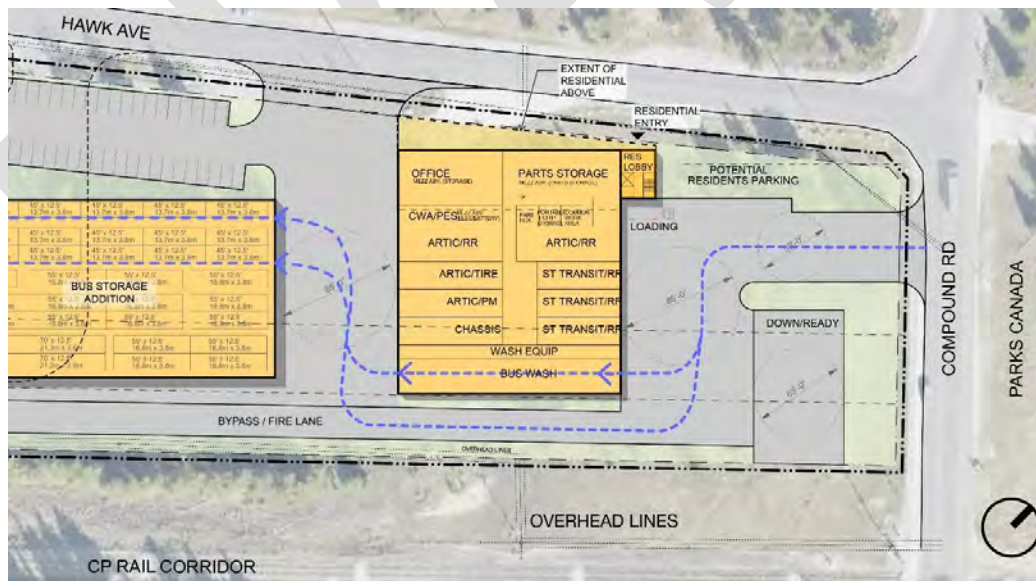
New Maintenance Building Level 1 Plan Showing Residential Entry & Footprint
